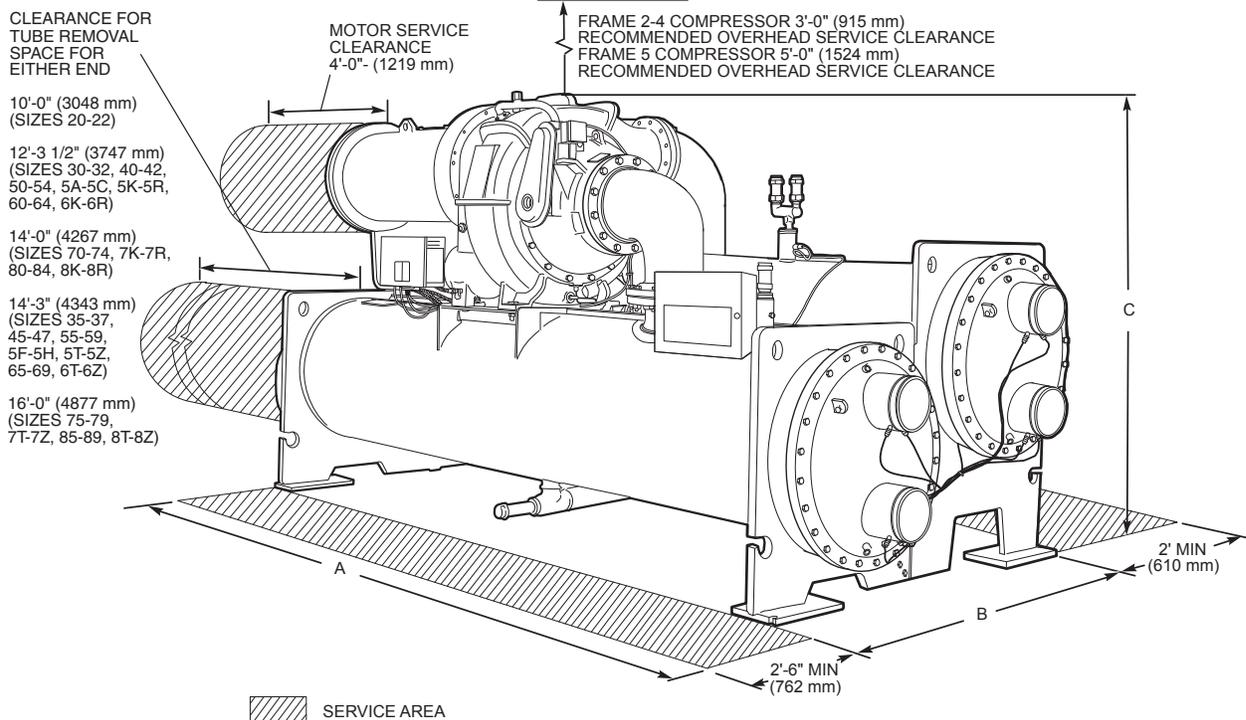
19XRV Dimensions (Refer to Tables 1 through 3)
